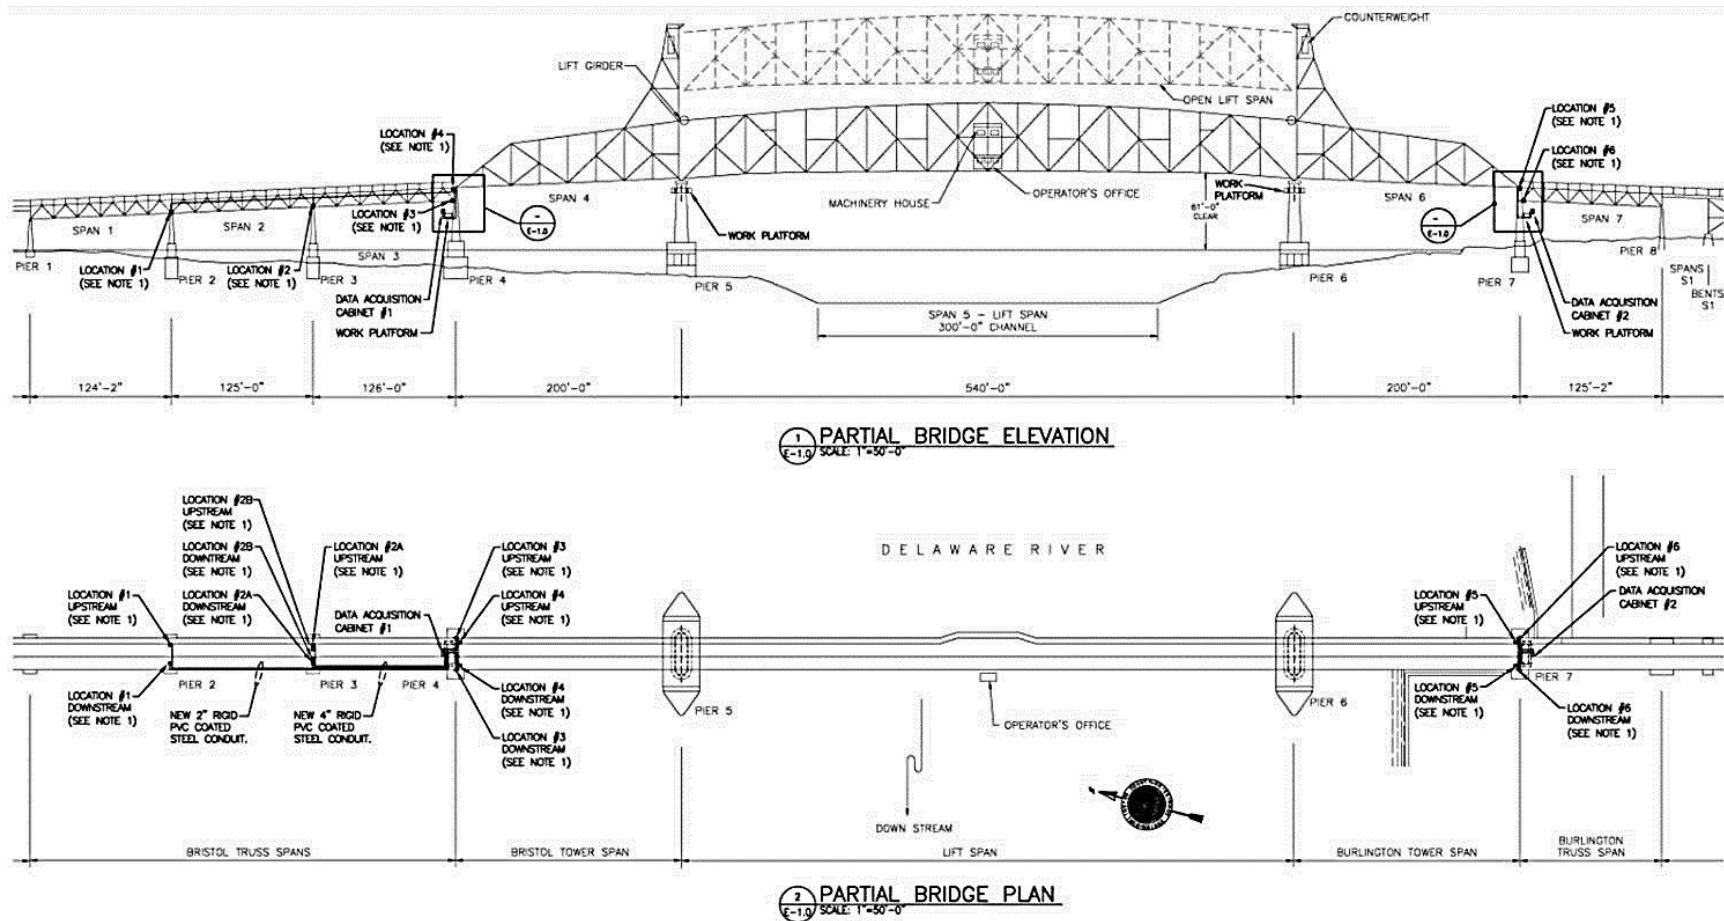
Bearing Locations for Incorporation of Sensing Technology
